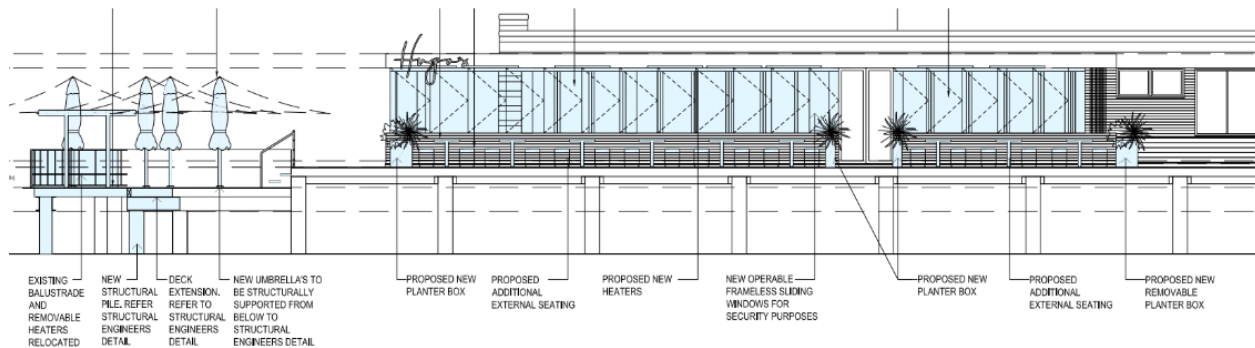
Southern Elevation / section A-A (Source: Squillace, Existing/ Proposed Section, Drawing no. DA 301, issue P4, 12.06.2020).
